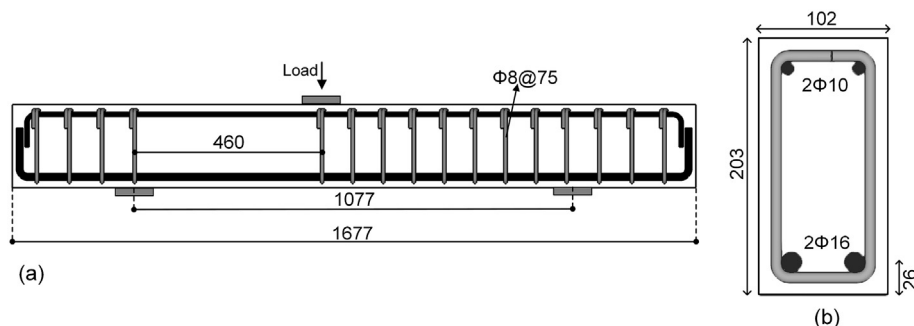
Medium-scale rectangular beams: (a) Beam geometry and reinforcement; (b) cross section (dimensions in mm).
